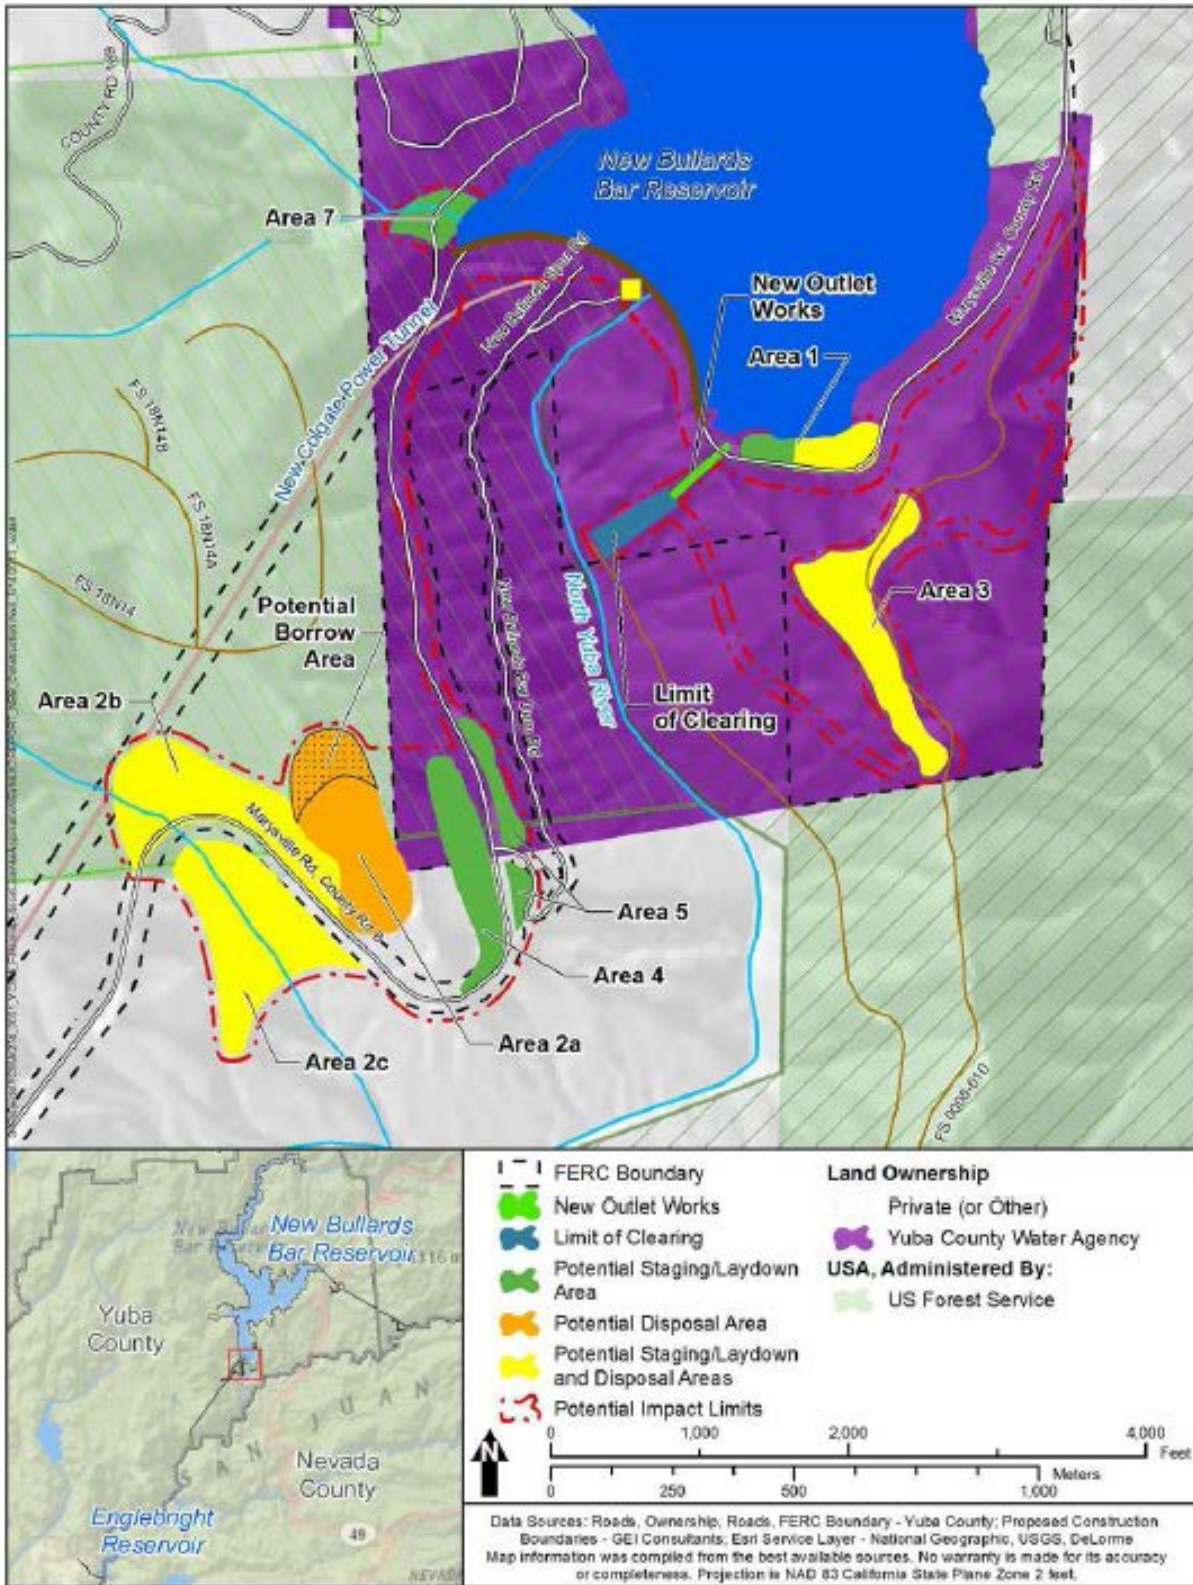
New Bullards Bar proposed new auxiliary flood control outlet construction area (Source: YCWA, 2017a).
